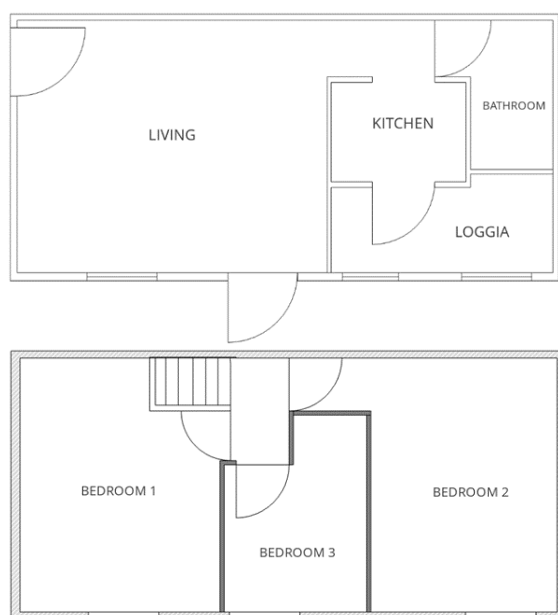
Floor plan view of the third and fourth stories of the building (duplex apartment).
